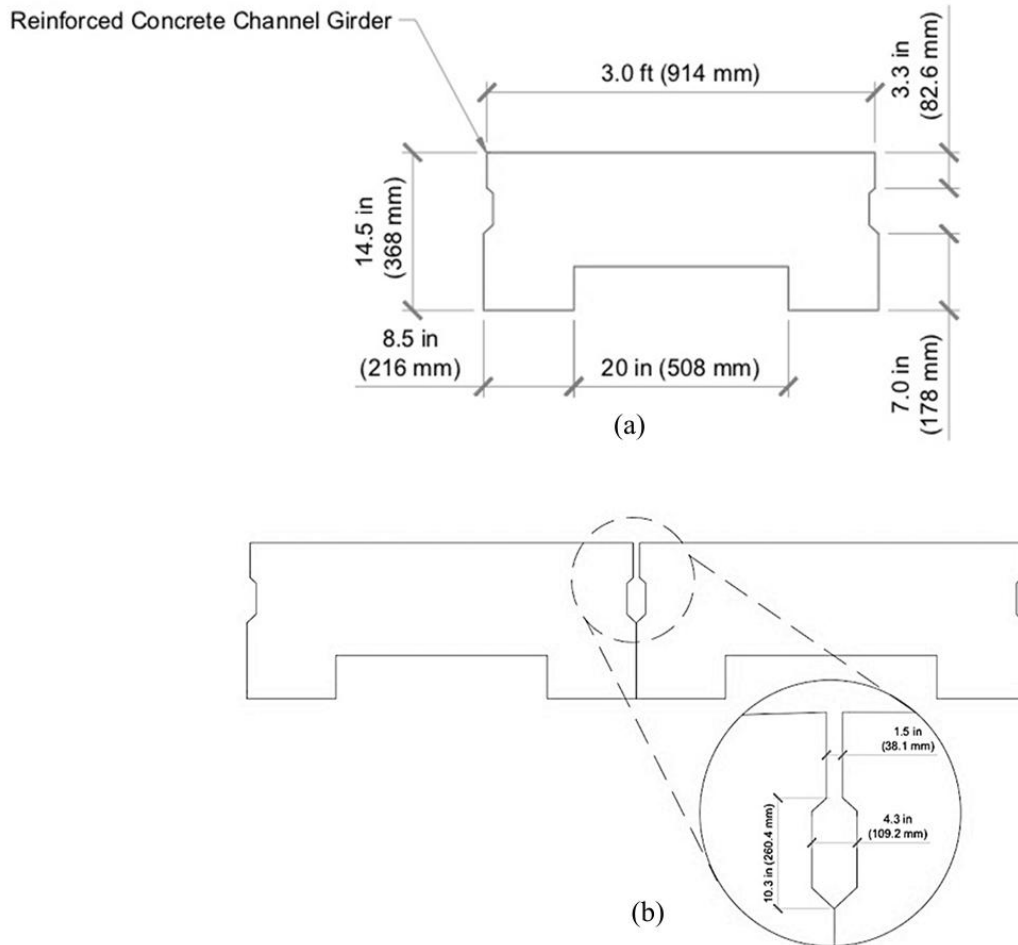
Bridge 5296 girder cross section - a) reinforced concrete channel girder cross-section; b) shear key detail; (UHPC Phase IV, Figure 5.109)
